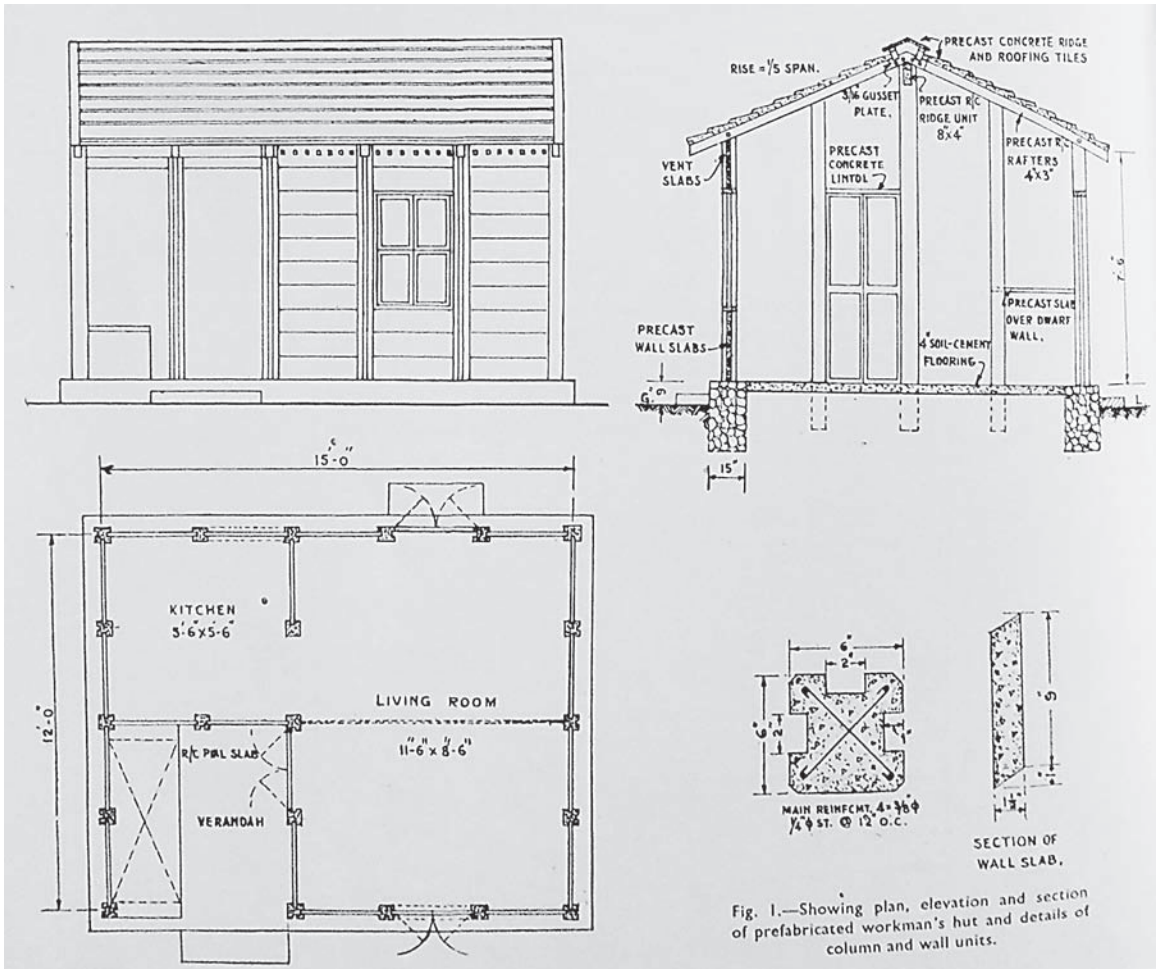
Showing plan, elevation and section of prefabricated workman's hut and details of column and wall units.
